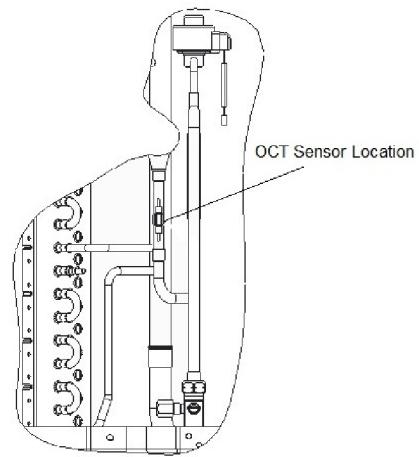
HP Outdoor Coil Thermistor (OCT) Attachment
